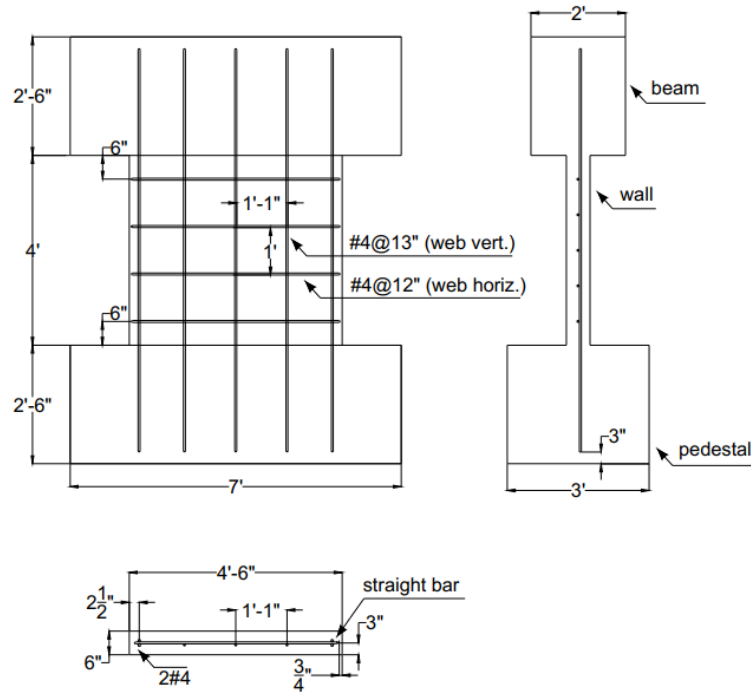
Layout of pier specimens tested by Massone et al. (2006).
